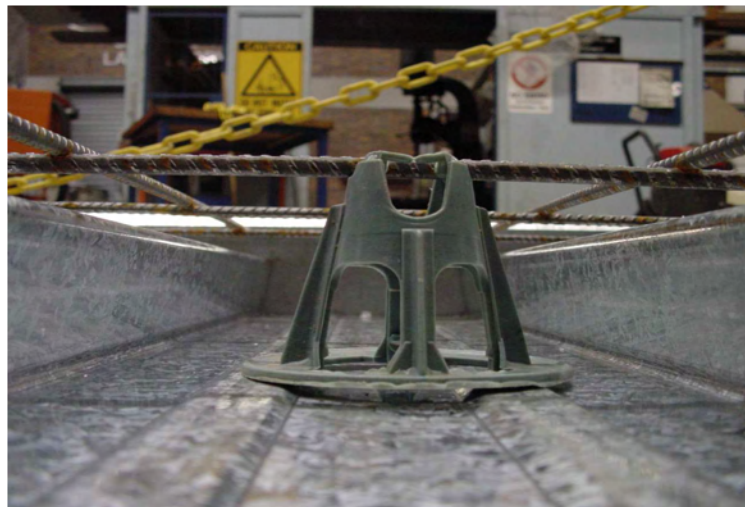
describes the fully prepared, ready to concrete steel-deck panels.
